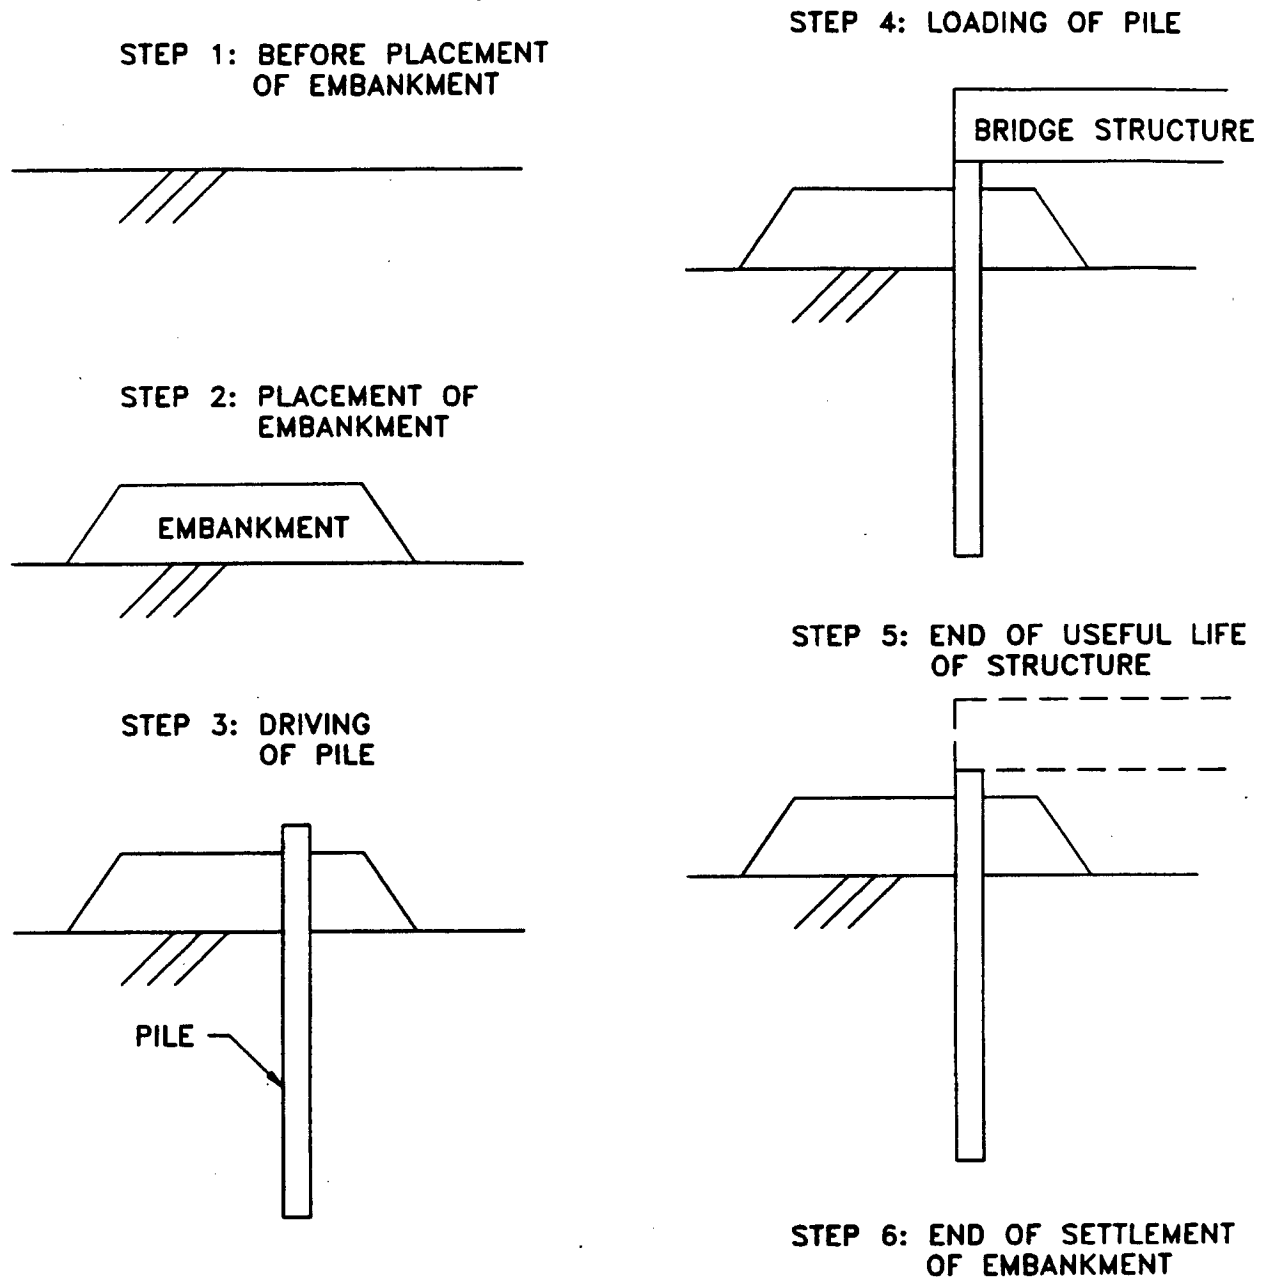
Steps in the settlement of a bridge abutment foundation.
